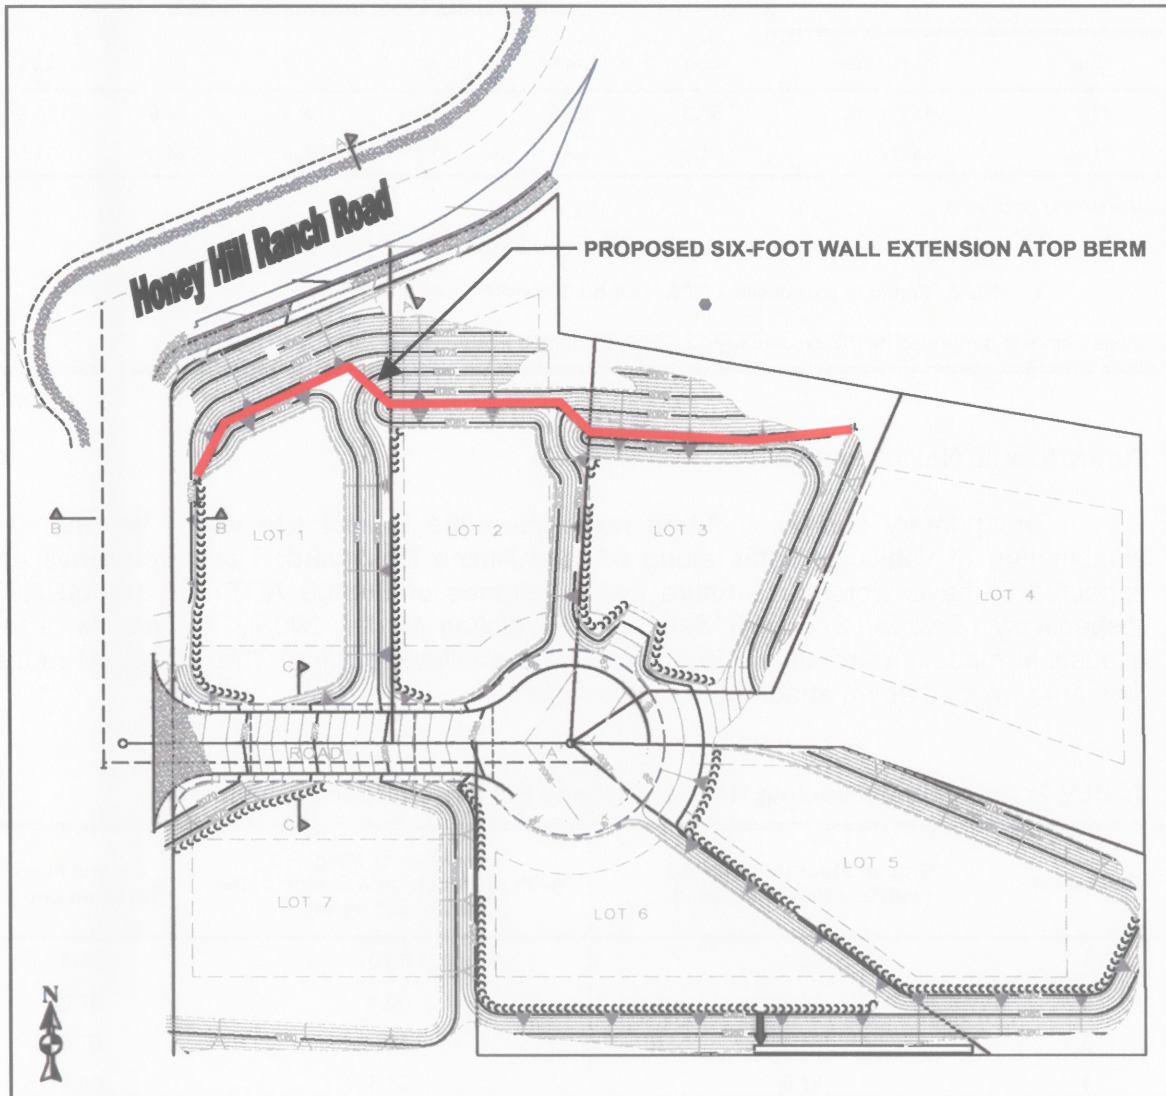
Proposed Mitigation Plan for Project Site (ISE 8/05)
